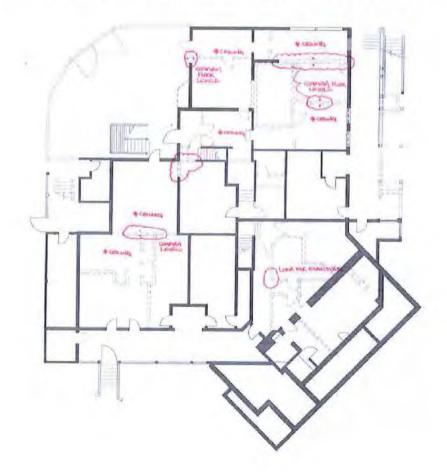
PHOTOS: STANLEY PARK FISH HOUSE RESTAURANT
